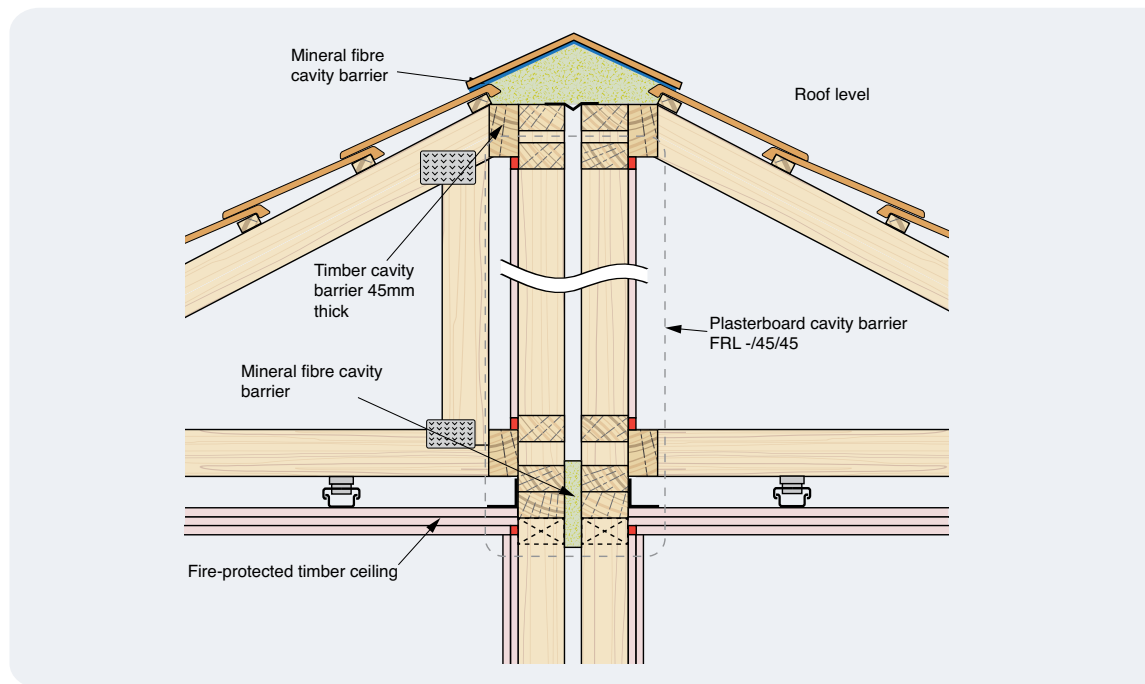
Roof space Option 2 fire-protected timber ceiling and cavity barriers within roof space.
